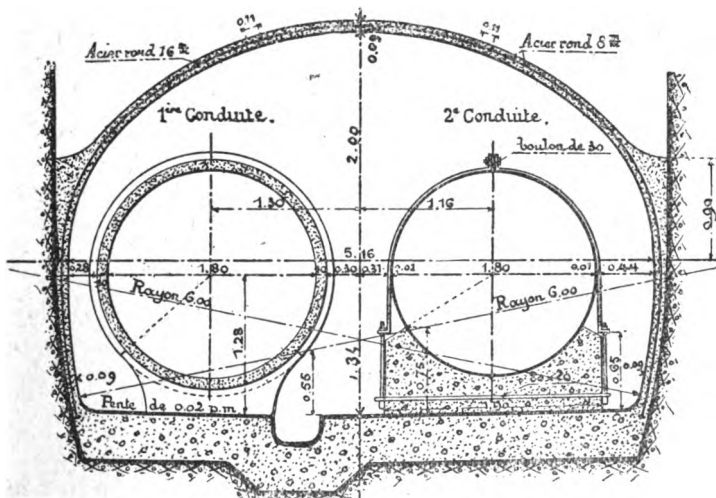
Section through Tunnel 17 feet wide, and Reinforced Concrete Sewer for Sewage Disposal System of the City of Paris.
